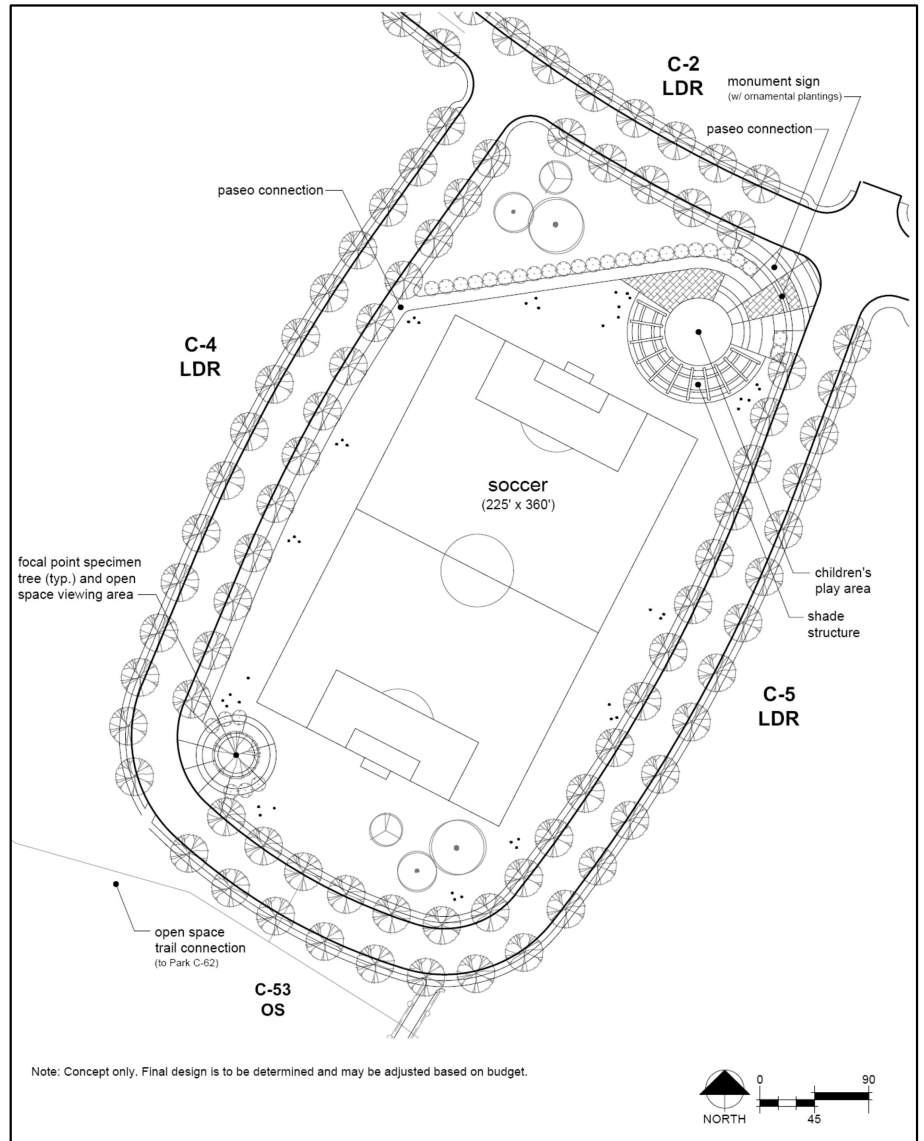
Concept Plan for Neighborhood Park (C-61)
